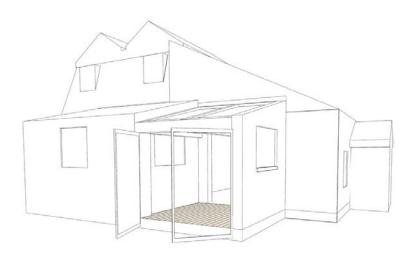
External perspective view of the new winter garden room extension, new brick wall to match existing, glazed double doors, obscured glazing rooflights and timber floor finish.
